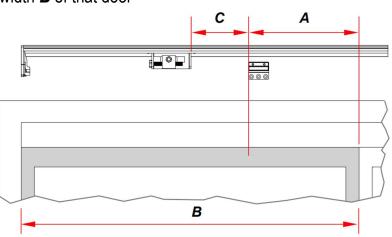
Right-opening sliding door: belt tensioner and bottom bracket. The left side is shown with sliding door closed.
